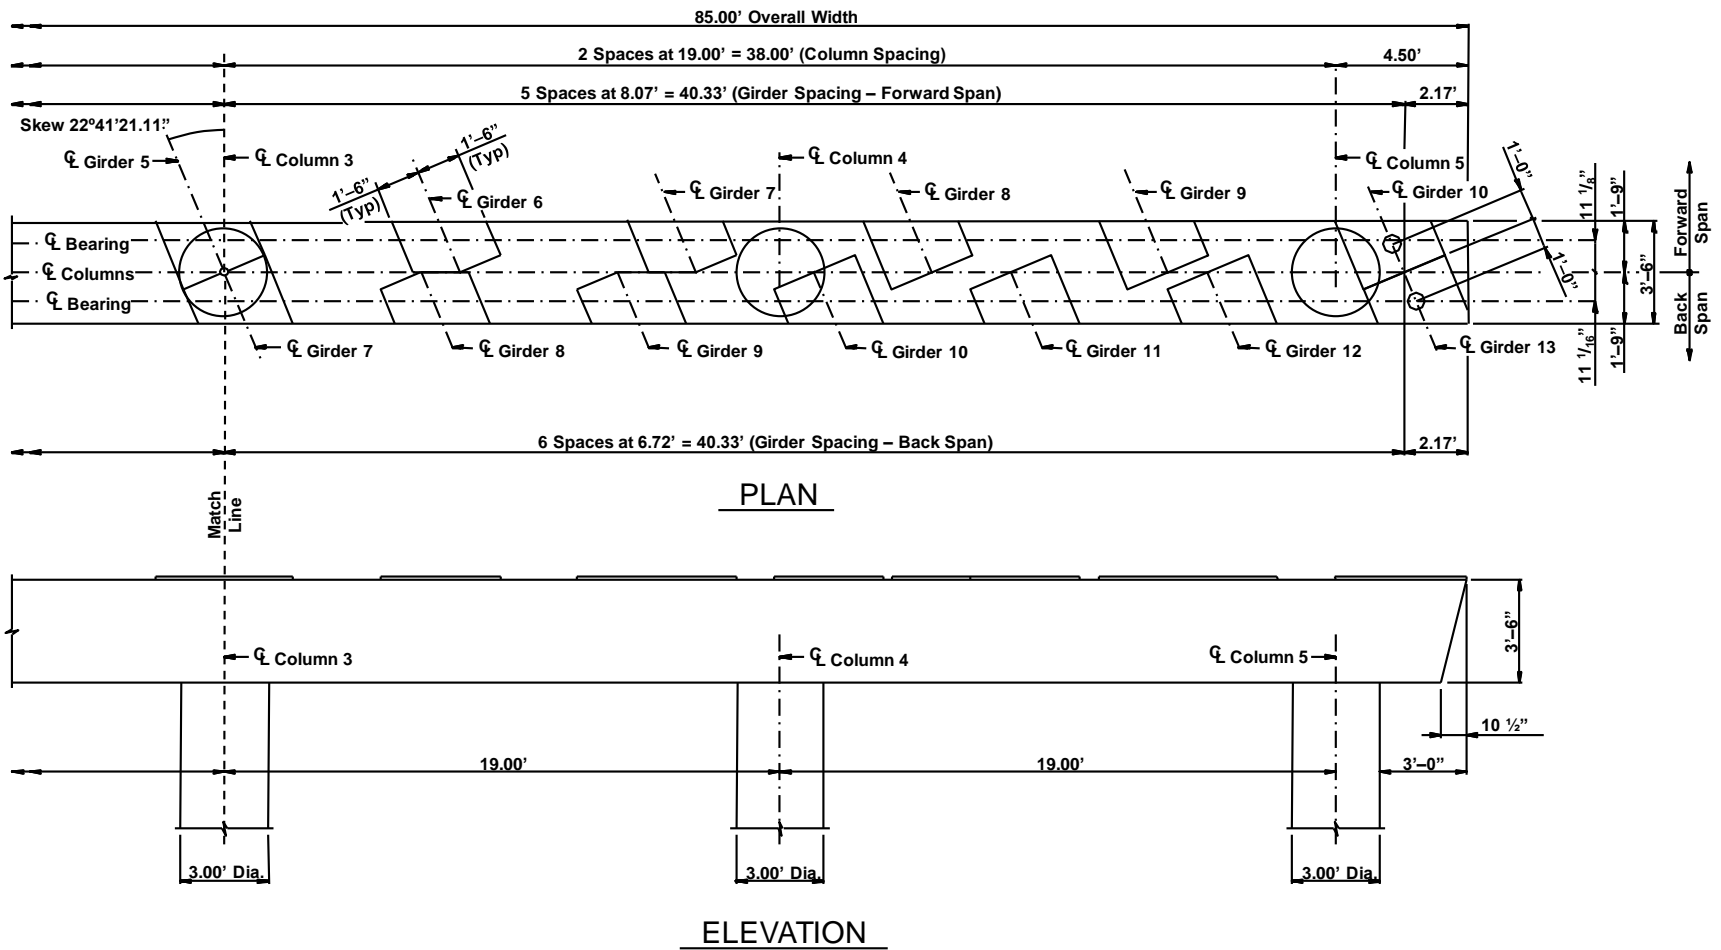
Plan and Elevation Views of Bent Cap – Right (from Williams et al., 2012)
